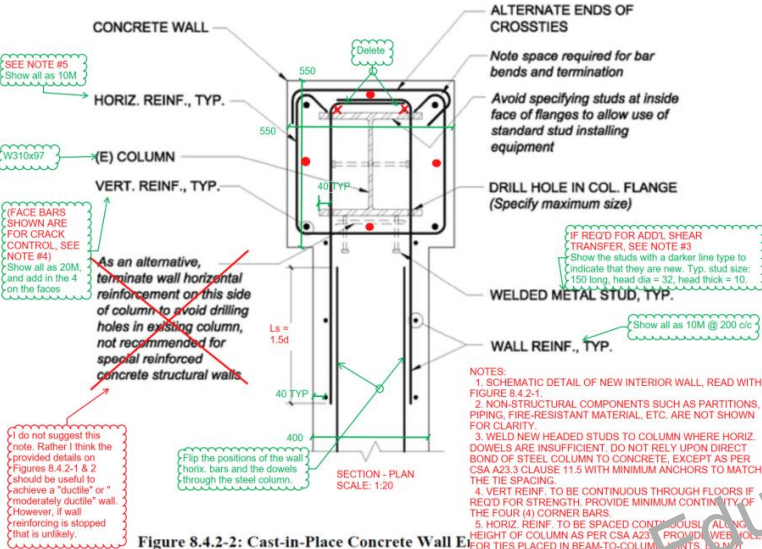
Cast-in-Place Concrete Wall Encasing Existing Column
